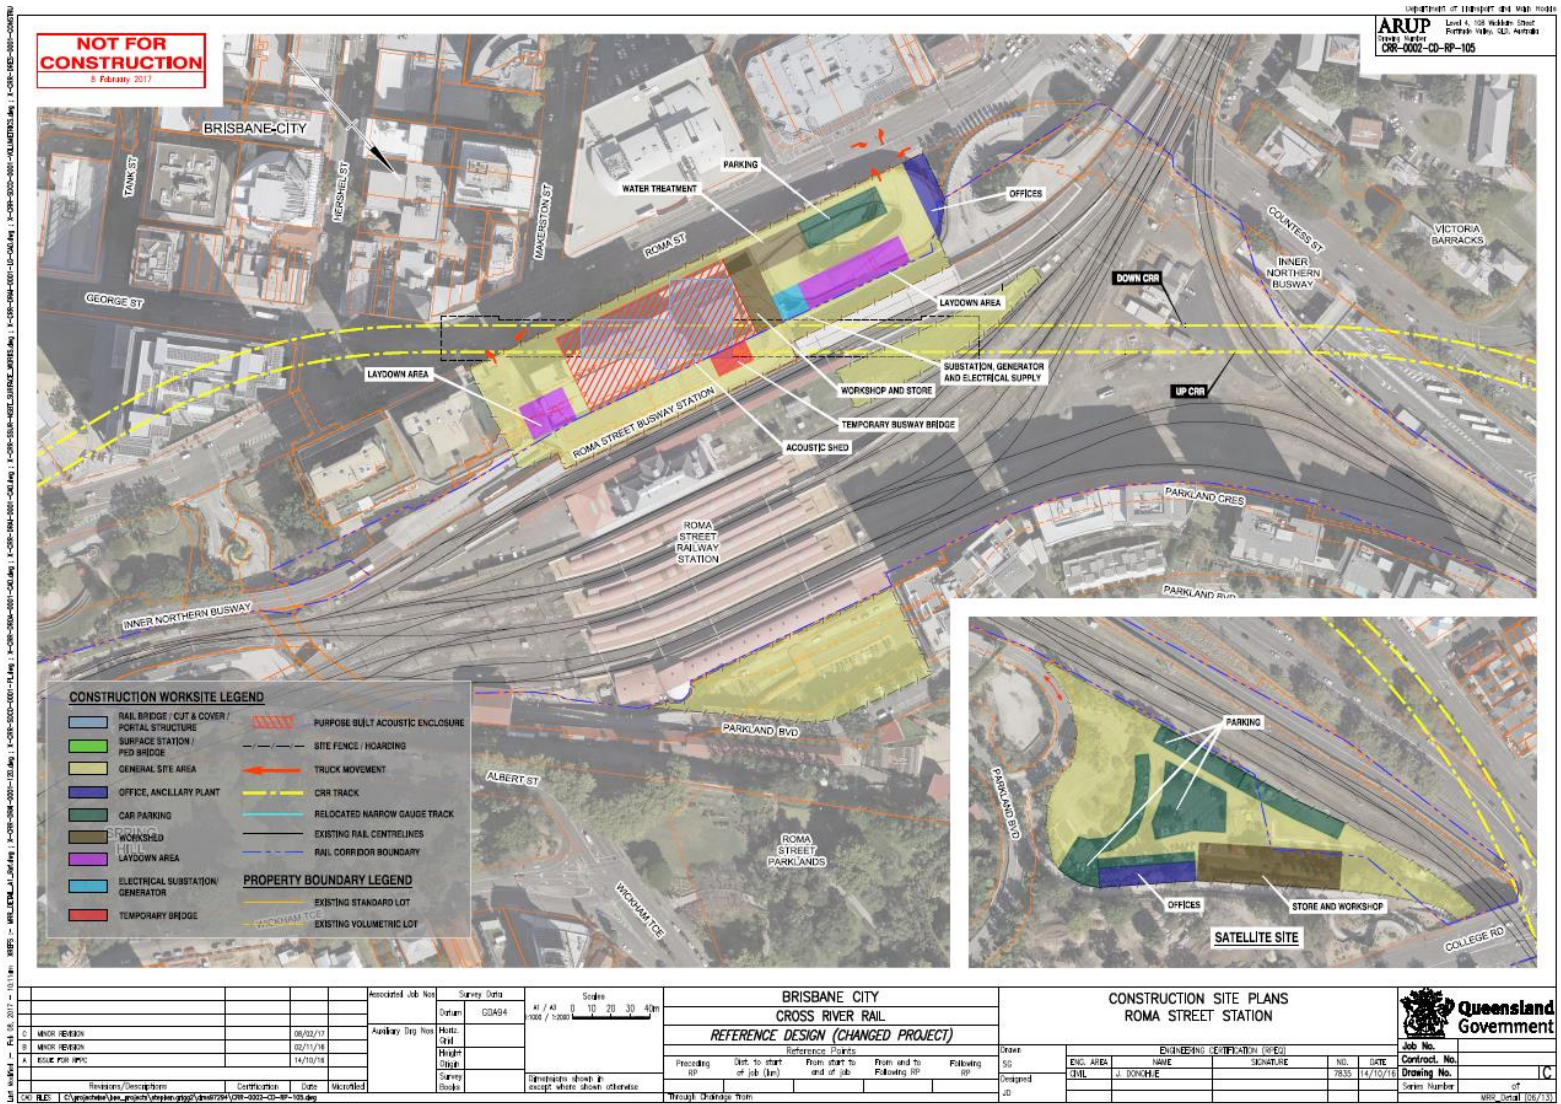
Approved Roma Street station construction site areas (yellow), including the construction site adjacent to Platform 10 (Source: June 2018 project change application)
